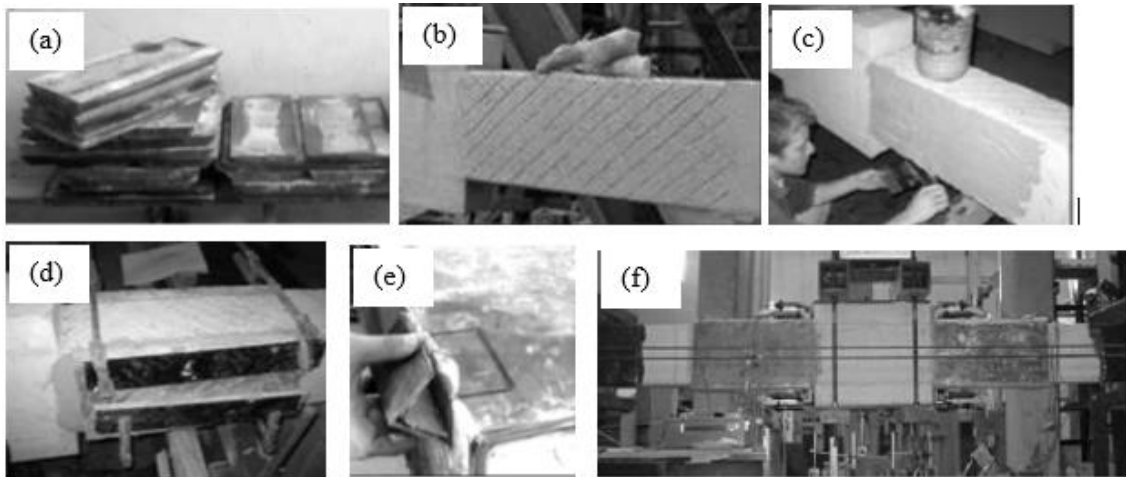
(a) Prefabricated HPFRCC panels, (b) preparation of surfaces of columns, (c) application of epoxy to surface of column (d) installation of HPFRCC panels on the columns and bonding of steel corners (e) application of steel corner (f) test of retrofitted specimen (modified from Ilki et al. 2004)
